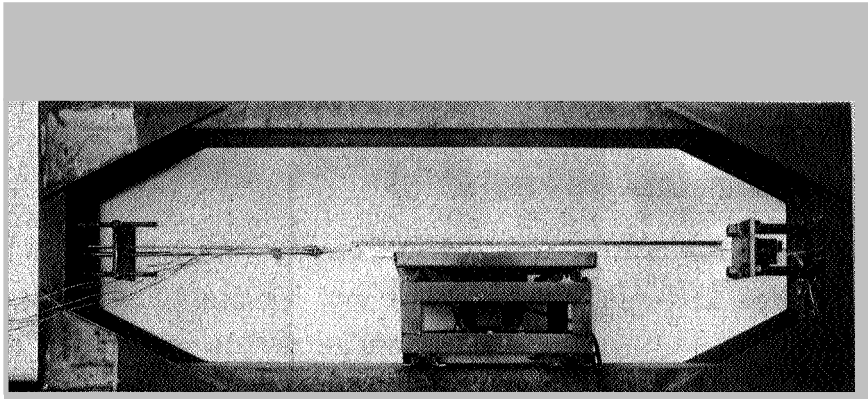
Prestressing Fixture Showing Mold Mounted in Position on Vibrating Table with Load Cell on Left
